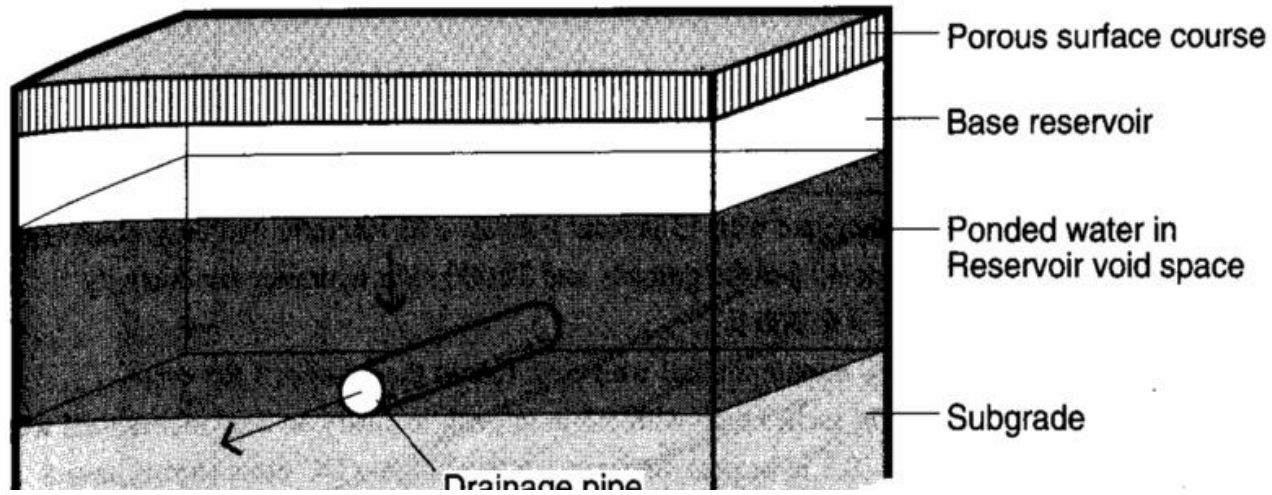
Cross Section of a Typical Permeable Pavement (Ferguson 2005)
